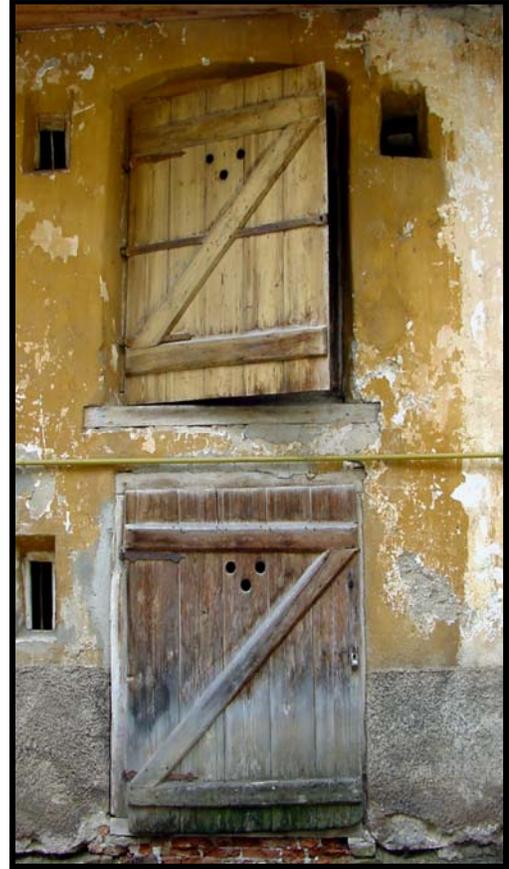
(Above right) detailed view of the kennel sheds built into the inner precinct wall for domestic storage.
